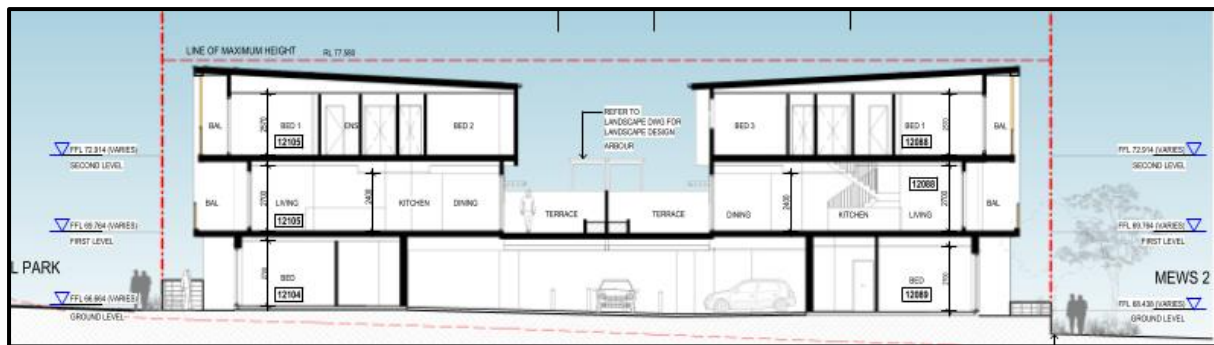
Typical cross-section of townhomes with at-grade parking and POS above.
